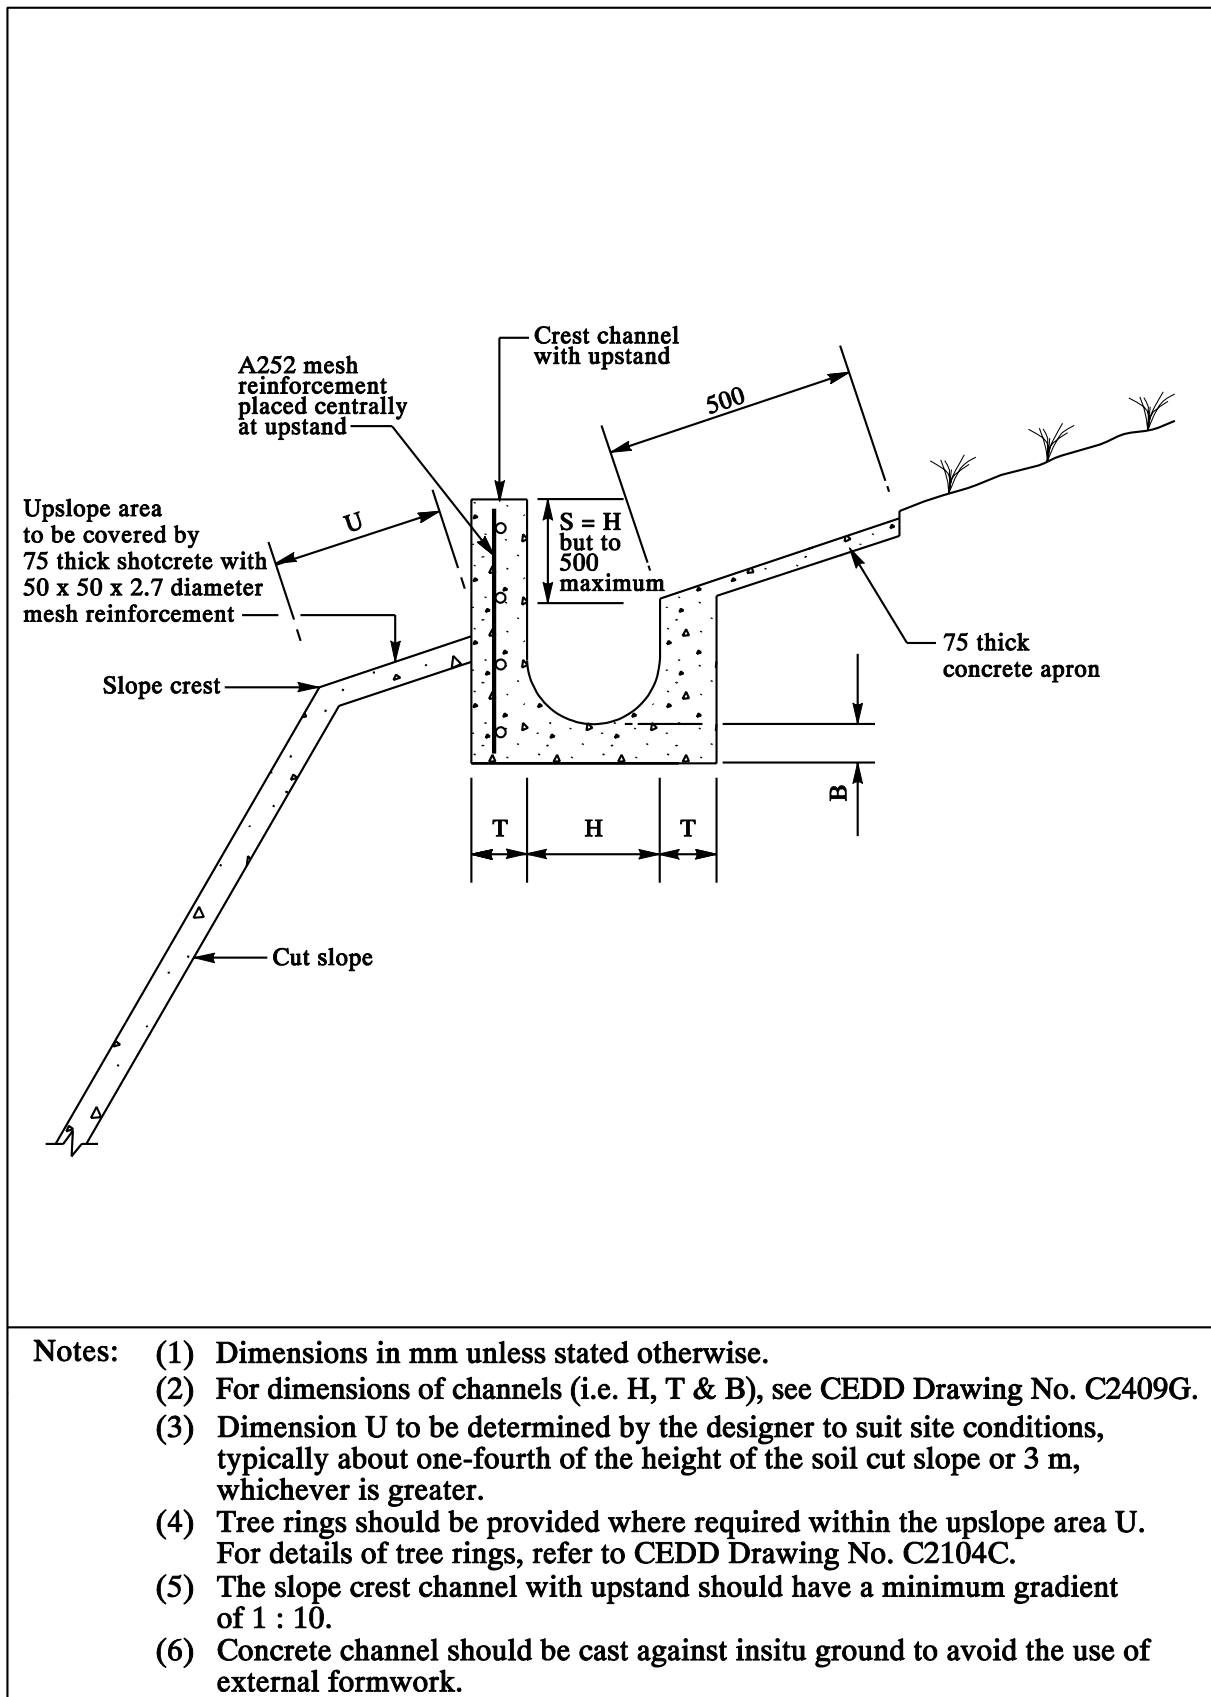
Shotcrete to Upslope Area and Crest Channel with Upstand
